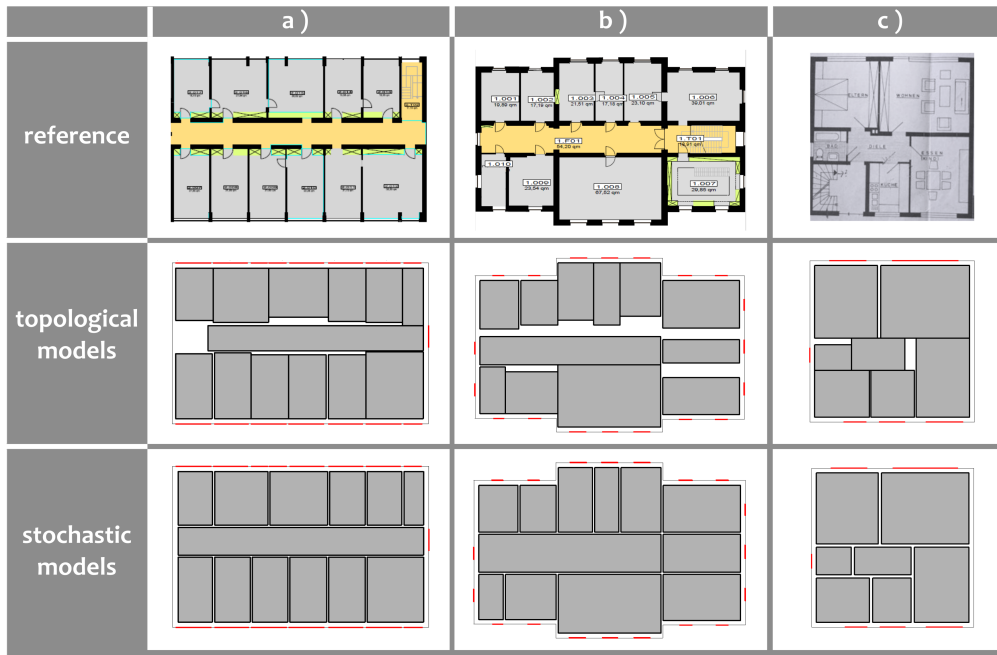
(a–c) Floor plan prediction demonstrated on three examples with regard to different requirements.
